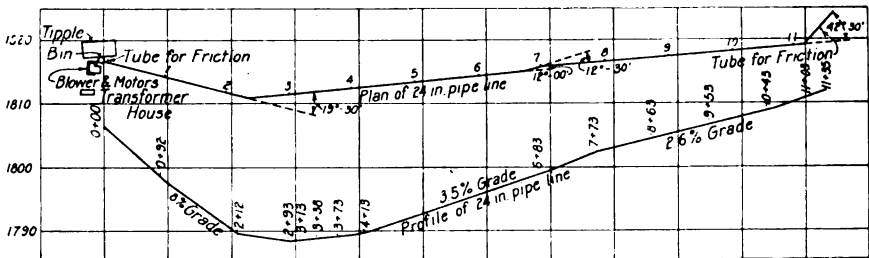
PLAN AND PROFILE OF EXPERIMENTAL PIPE LINES
